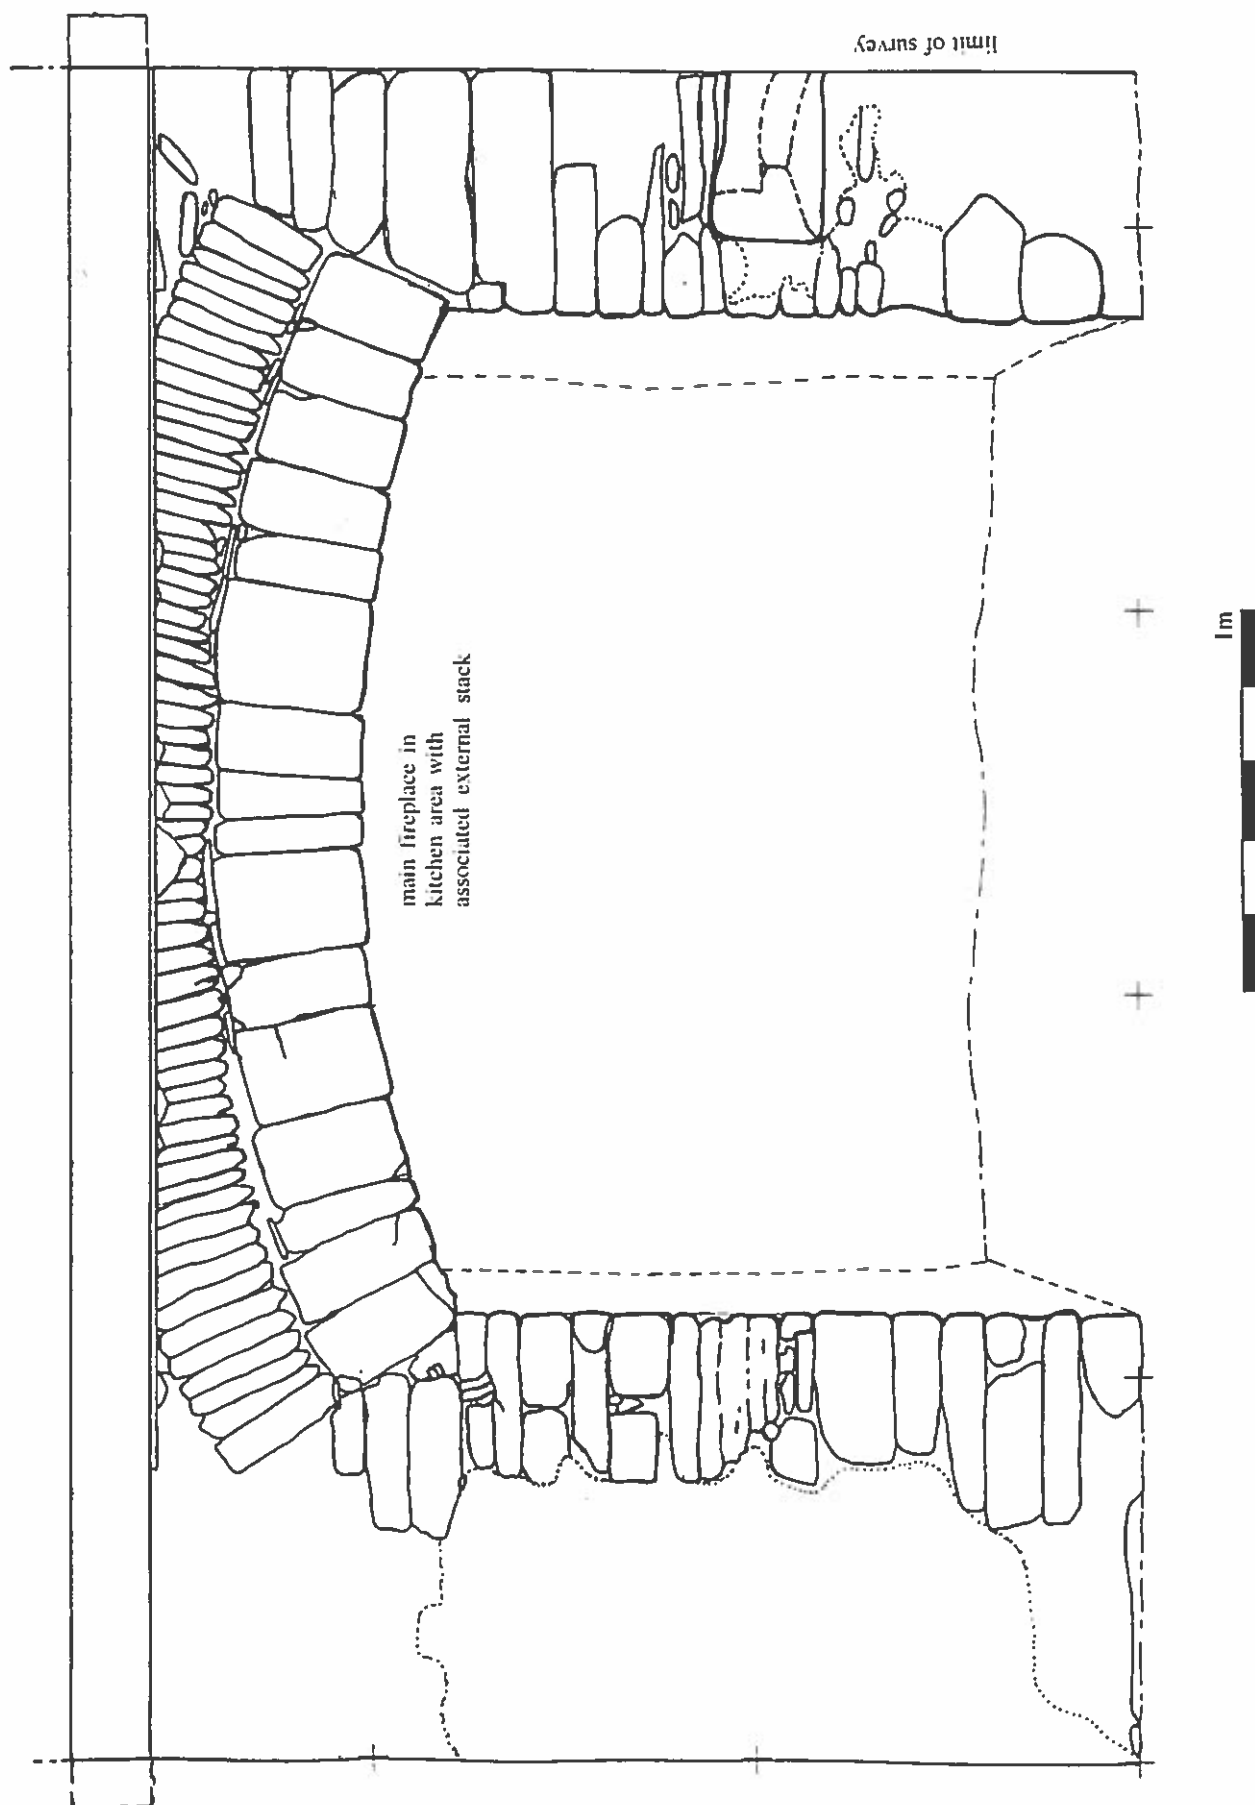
AREA A: NORTH-FACING INTERNAL ELEVATION AND FIREPLACE
